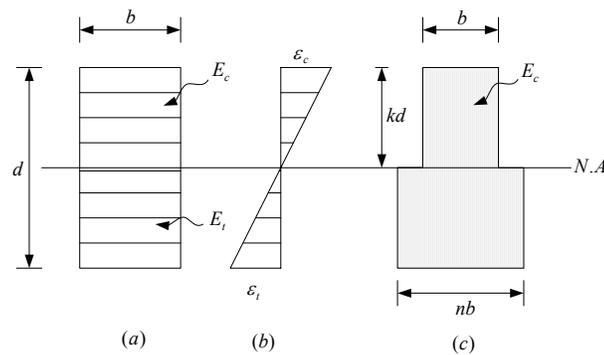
Glulam Girder: (a) Cross-Section; (b) Transformed Section.
